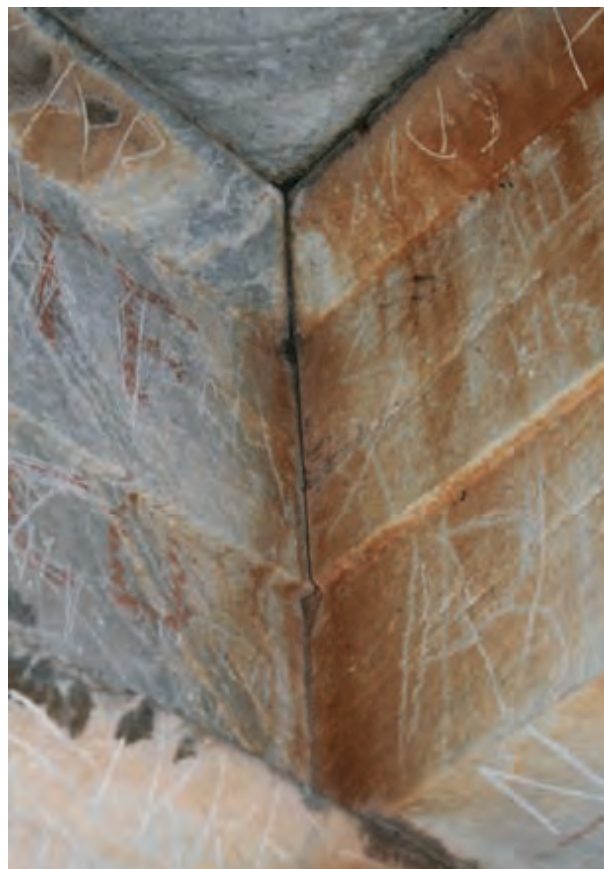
Detail of the corner between a ceiling beam and the epikranitis of the wall in the chamber.
